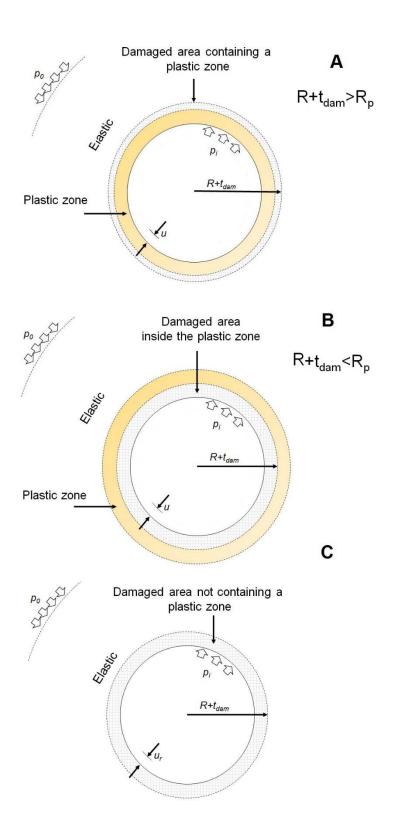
Sketch of a deep circular tunnel subjected to a hydrostatic stress field with a damaged zone containing a plastic zone (A); with a plastic zone extending beyond the damaged area (B); and with a damaged zone without considering a plastic zone (C).
